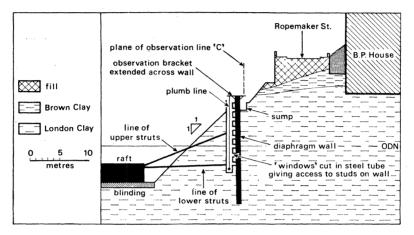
Section through north wall of basement excavation at Britannic House.
